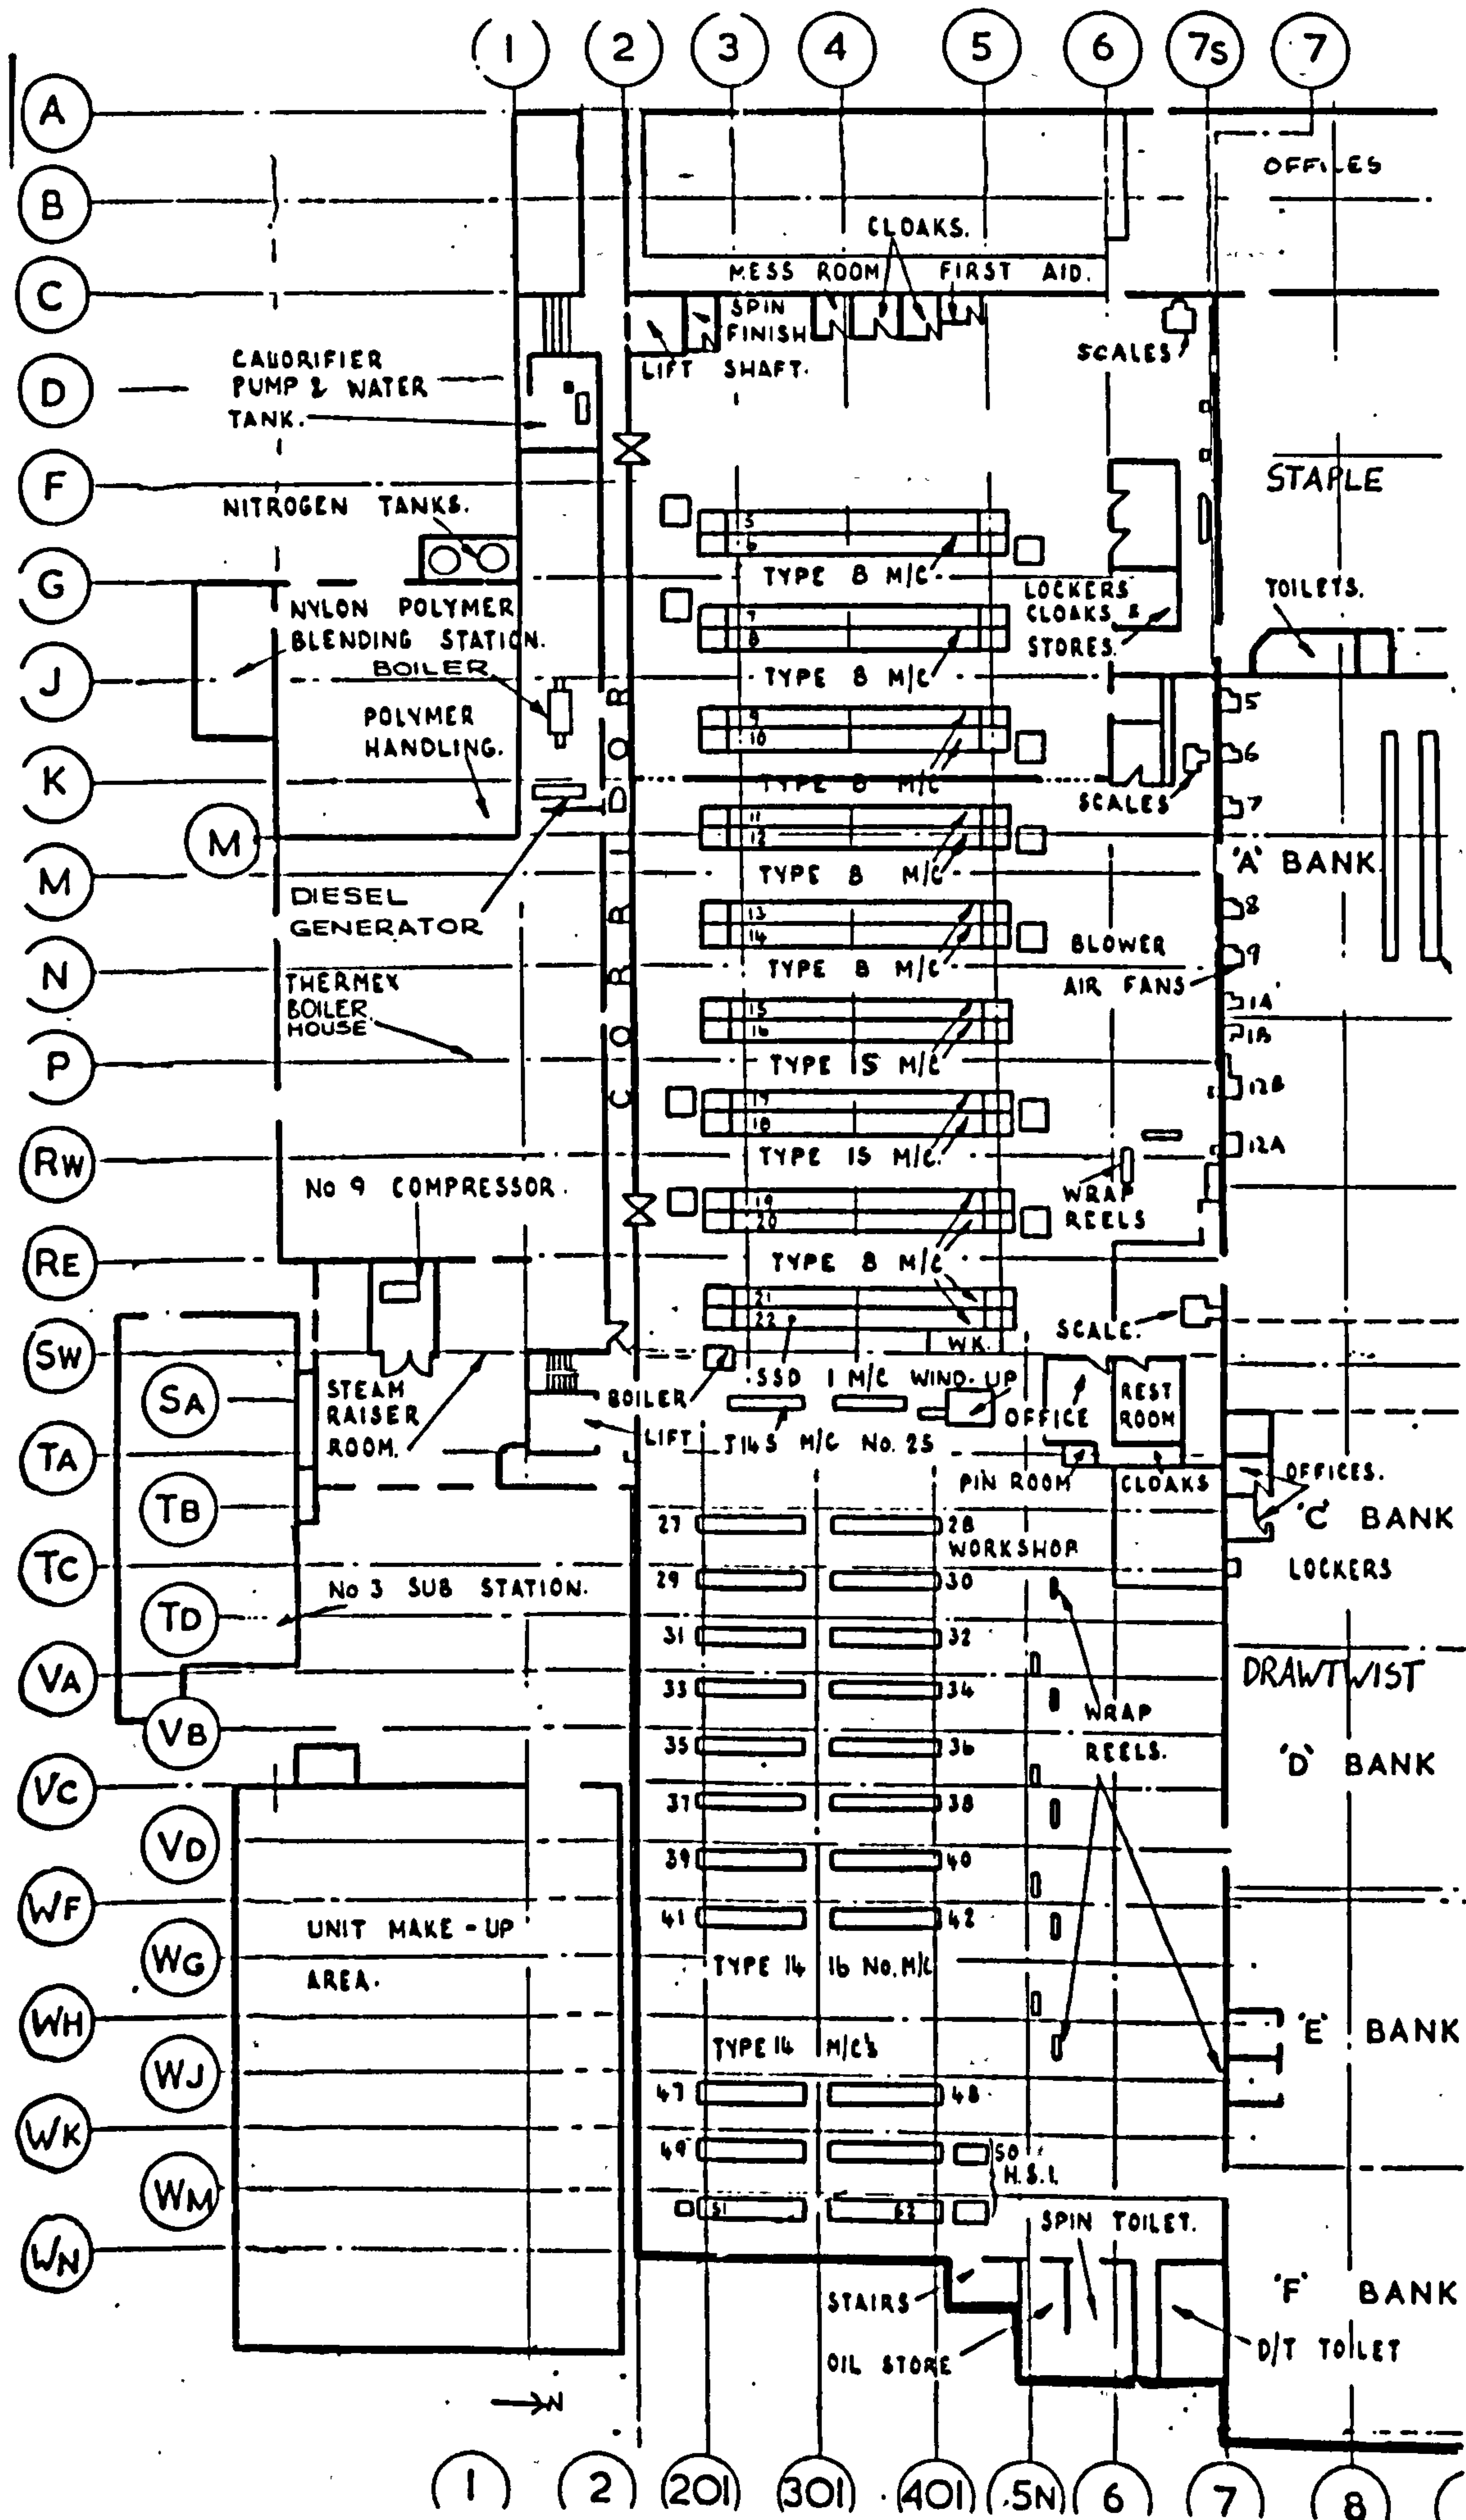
GROUND FLOOR PLAN (SPIN DOFF)
